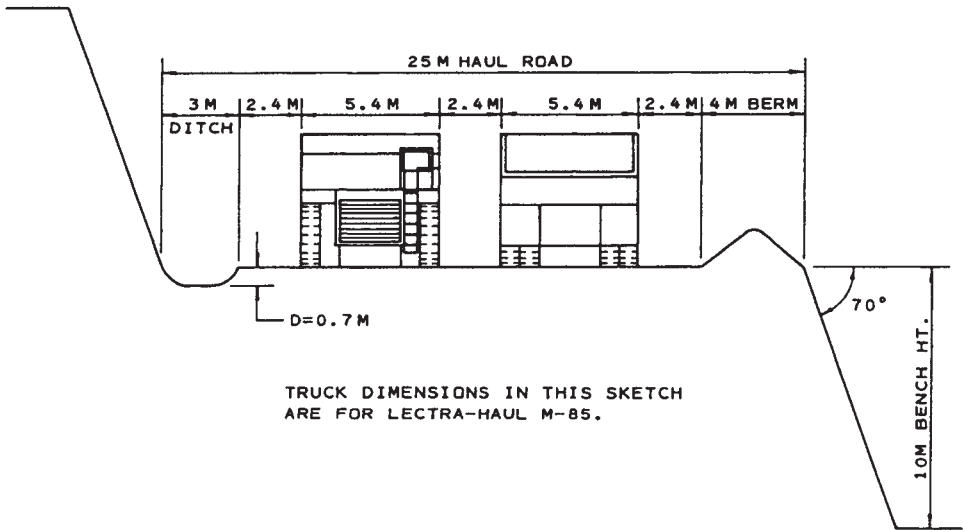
Typical design haulroad width for two-way traffic using 85 st capacity trucks (Couzens, 1979).
